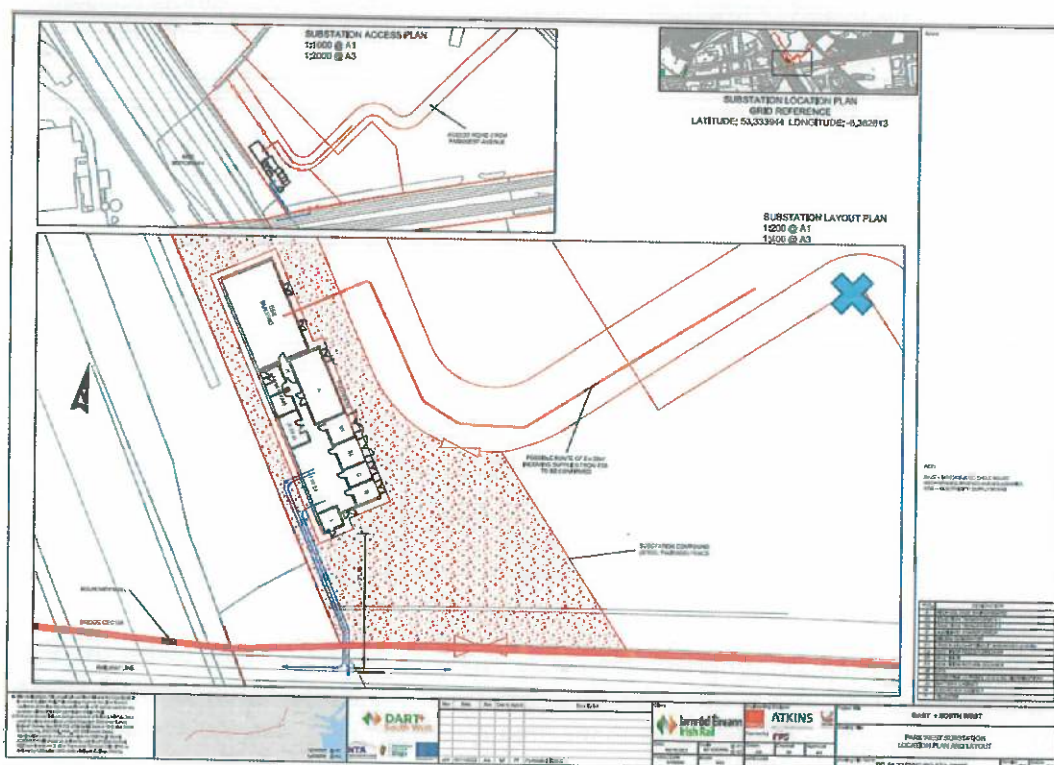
Extract from drawing submitted with DART + South West (Drawing title Park West Substation Location Plan and Layout - DP-04-23-DWG-RO-TTA-18856). Only a short section of electricity supply routing is shown on the drawing (terminating at the 'X' denoted by LDA).
